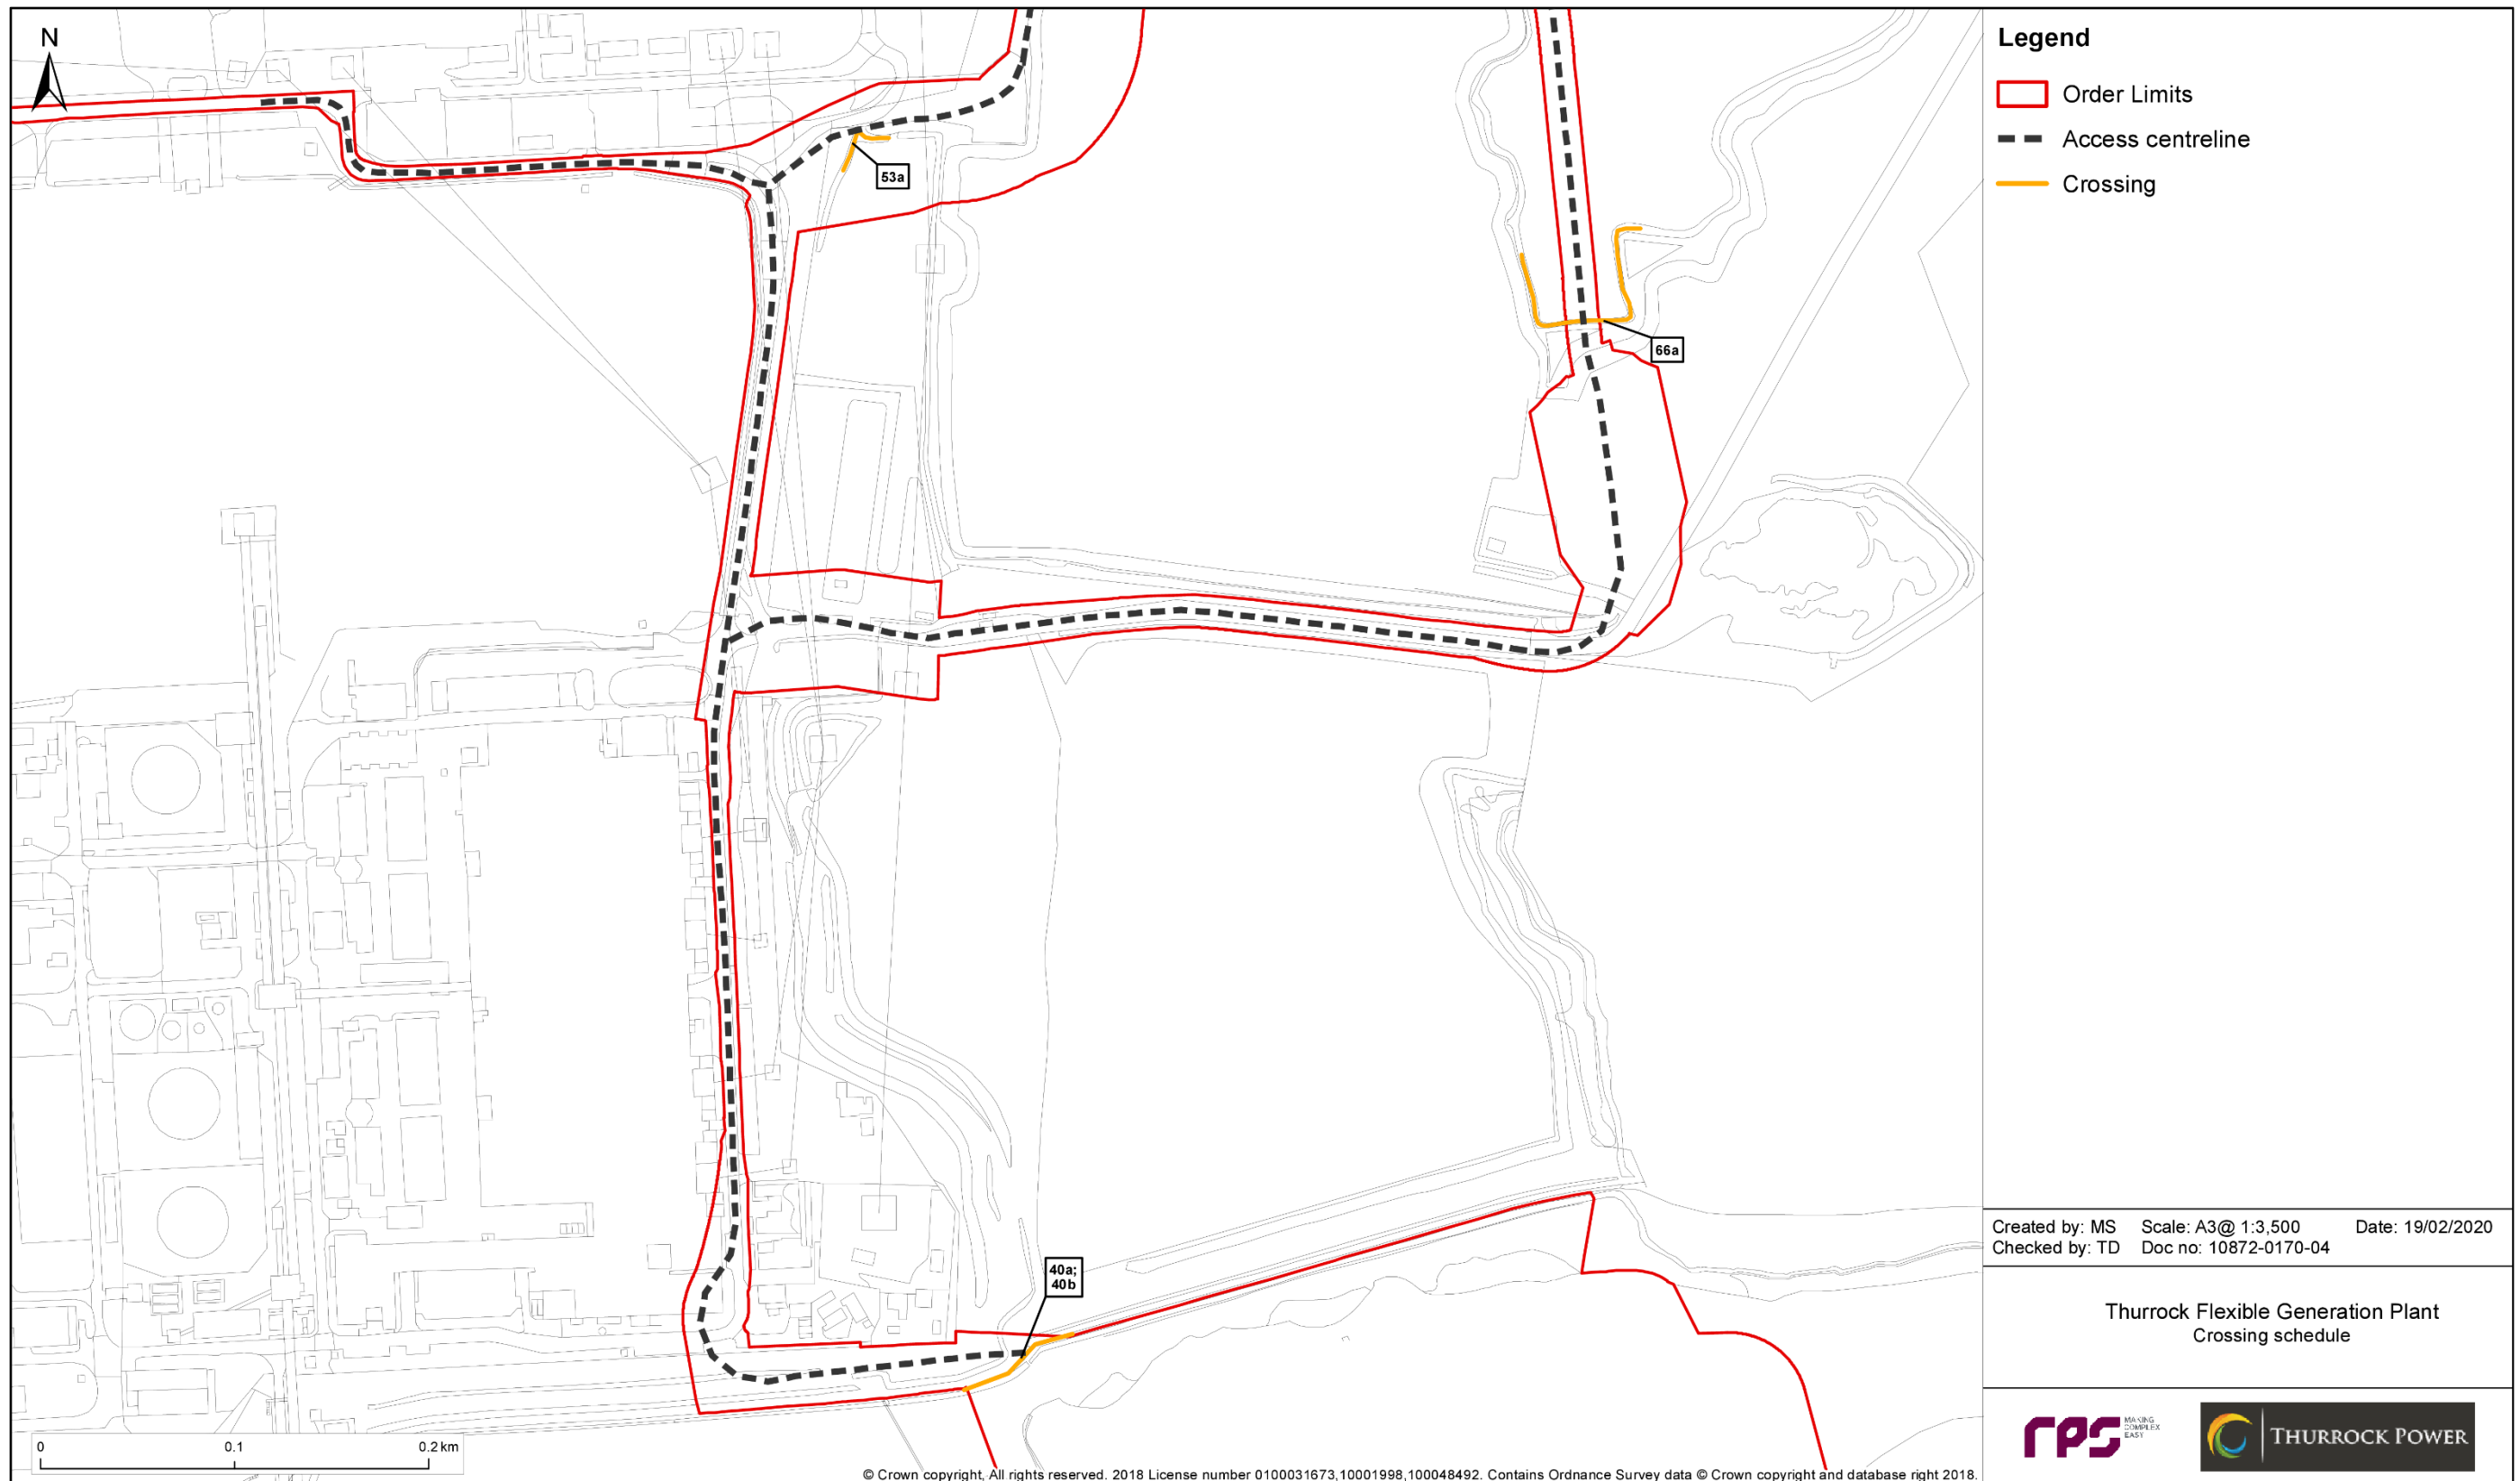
Gas pipeline, underground cable and access road crossings – sheet 5.
